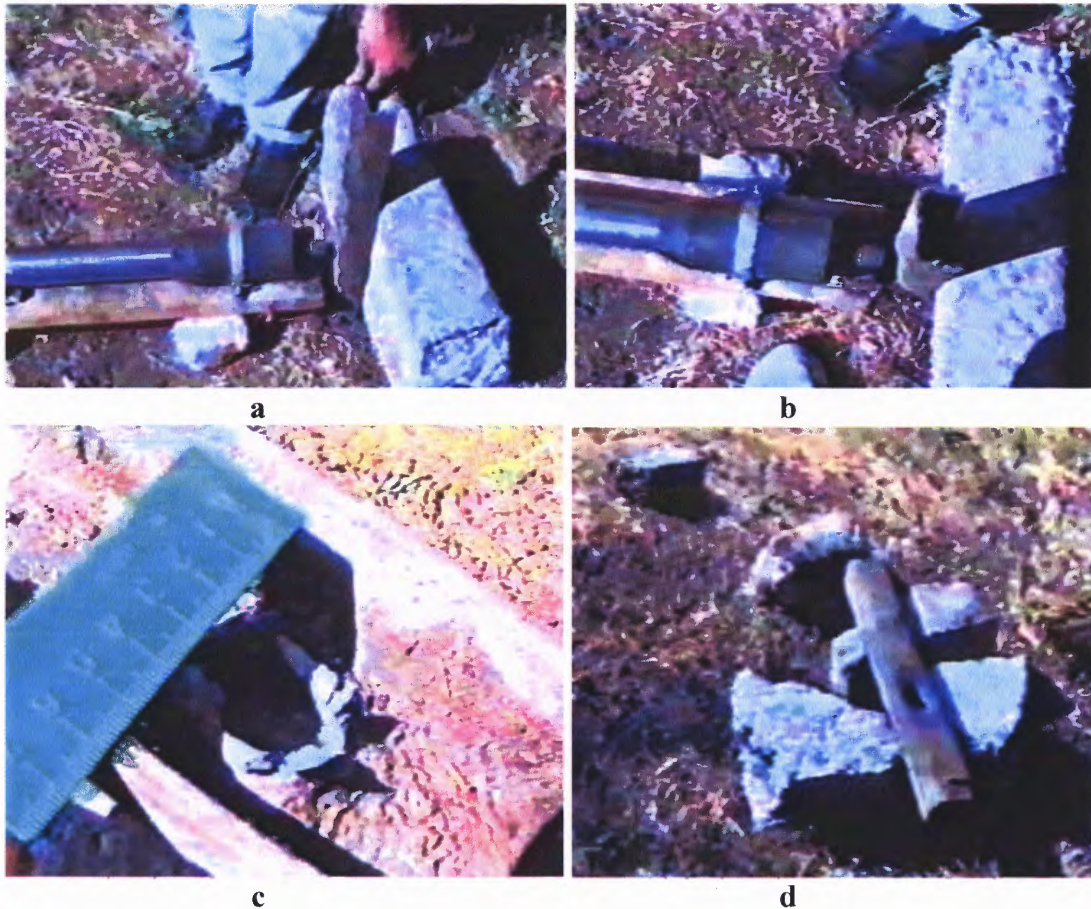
Destruction of concrete brand 300-500 block with a 6 mm steel plate
